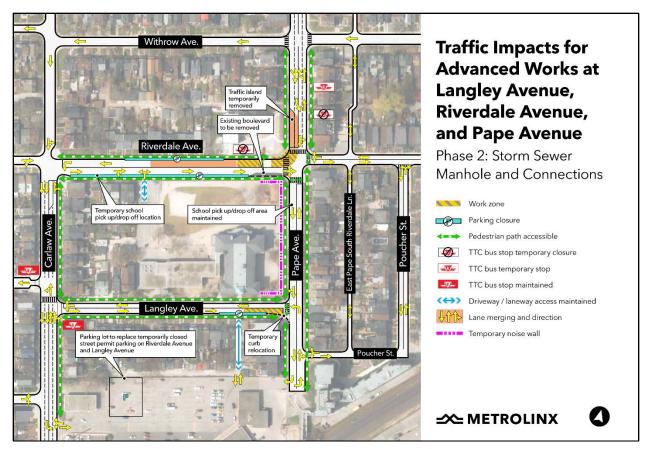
Pape and Riverdale Advanced Works – Storm Sewer Manholes and Connection Source: Metrolinx Duration – Approx. 4 months
